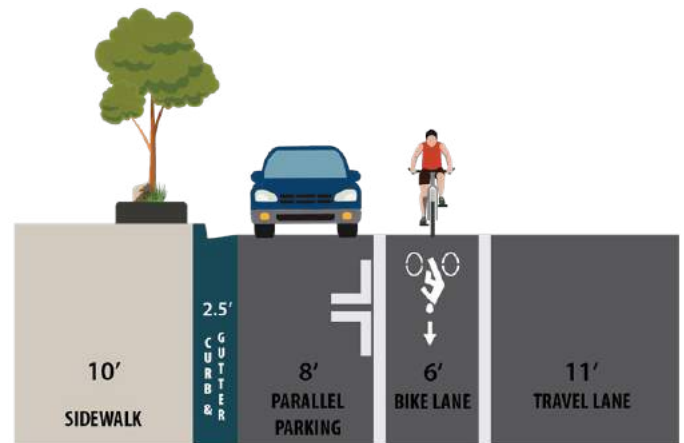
Half street cross-section of a road with parallel parking and bike lane.
